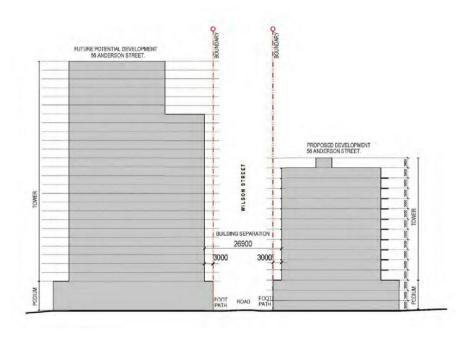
Massing Section 56 and 58 Anderson St Potential Towers
